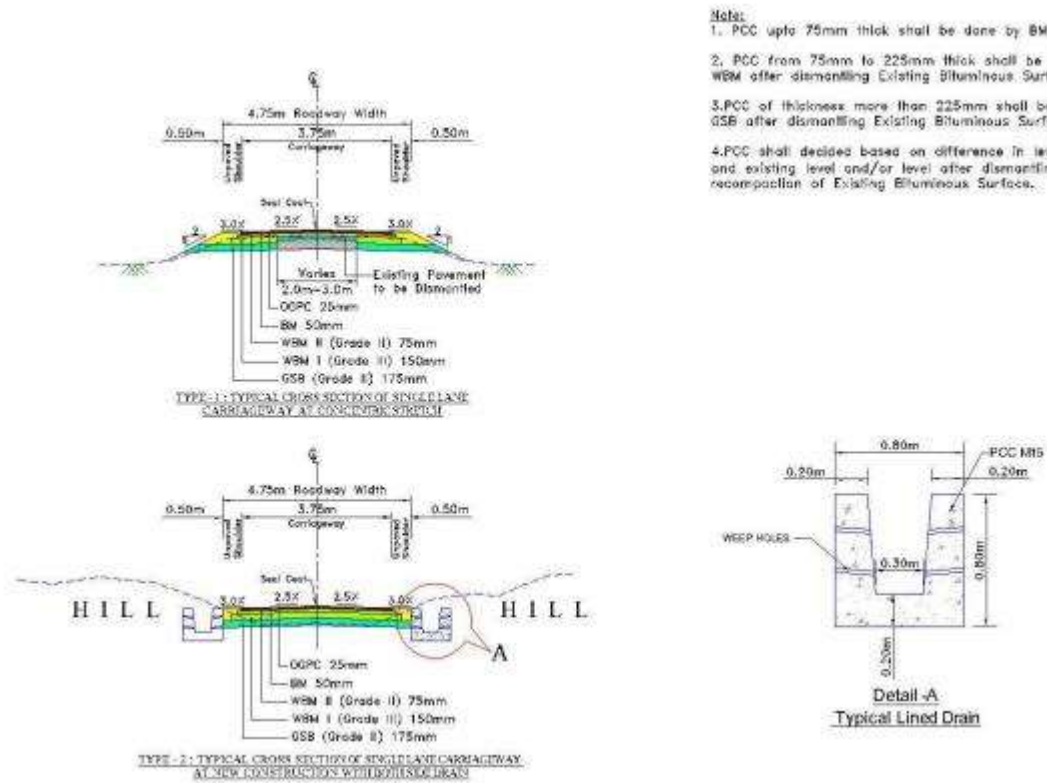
Typical Cross-Section of Single Lane carriageway at New Construction With Both Side Drain
